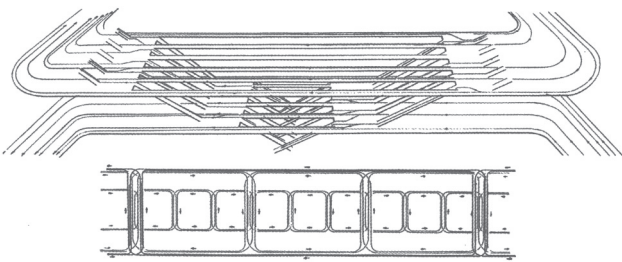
Kenzo TANGE, Tokyo Plan, 1960.
